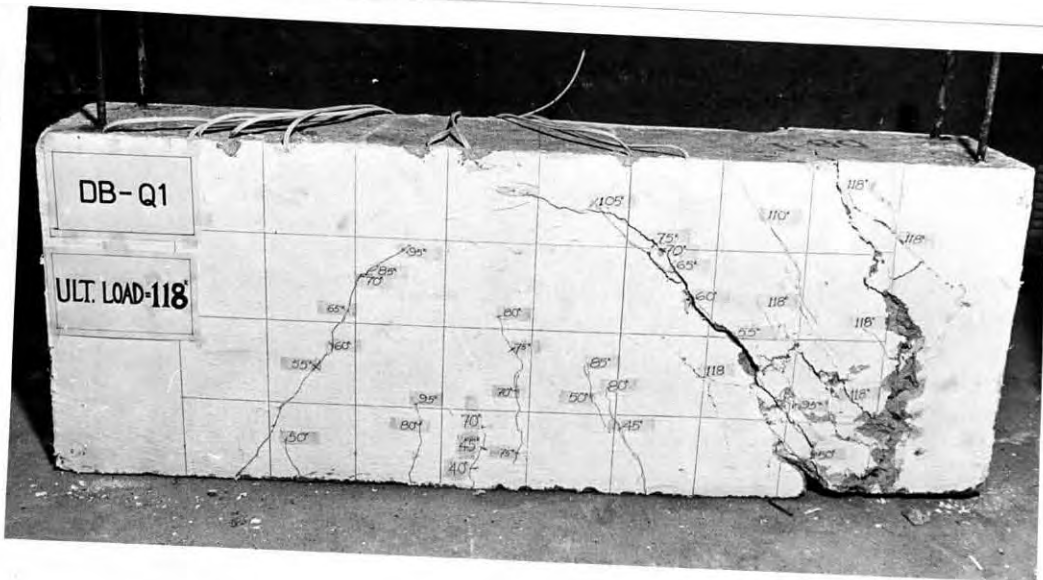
Mode of Failure and Crack Pattern of Beam DB-Q1
